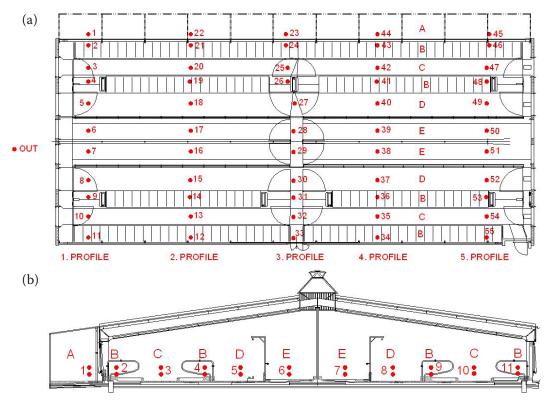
Plan of the investigated building and measuring points (a) ground plan and (b) a cross-section of building A – shelter; B – cubicle lying; C – manure passage; D – feeding area; E – feed passage; •1 – measurement points
